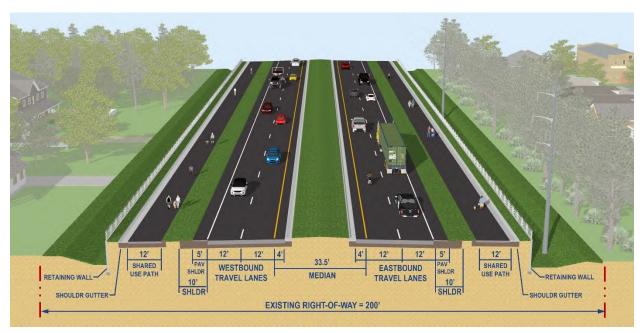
Cross Section of a Gravity Wall along SR 16
